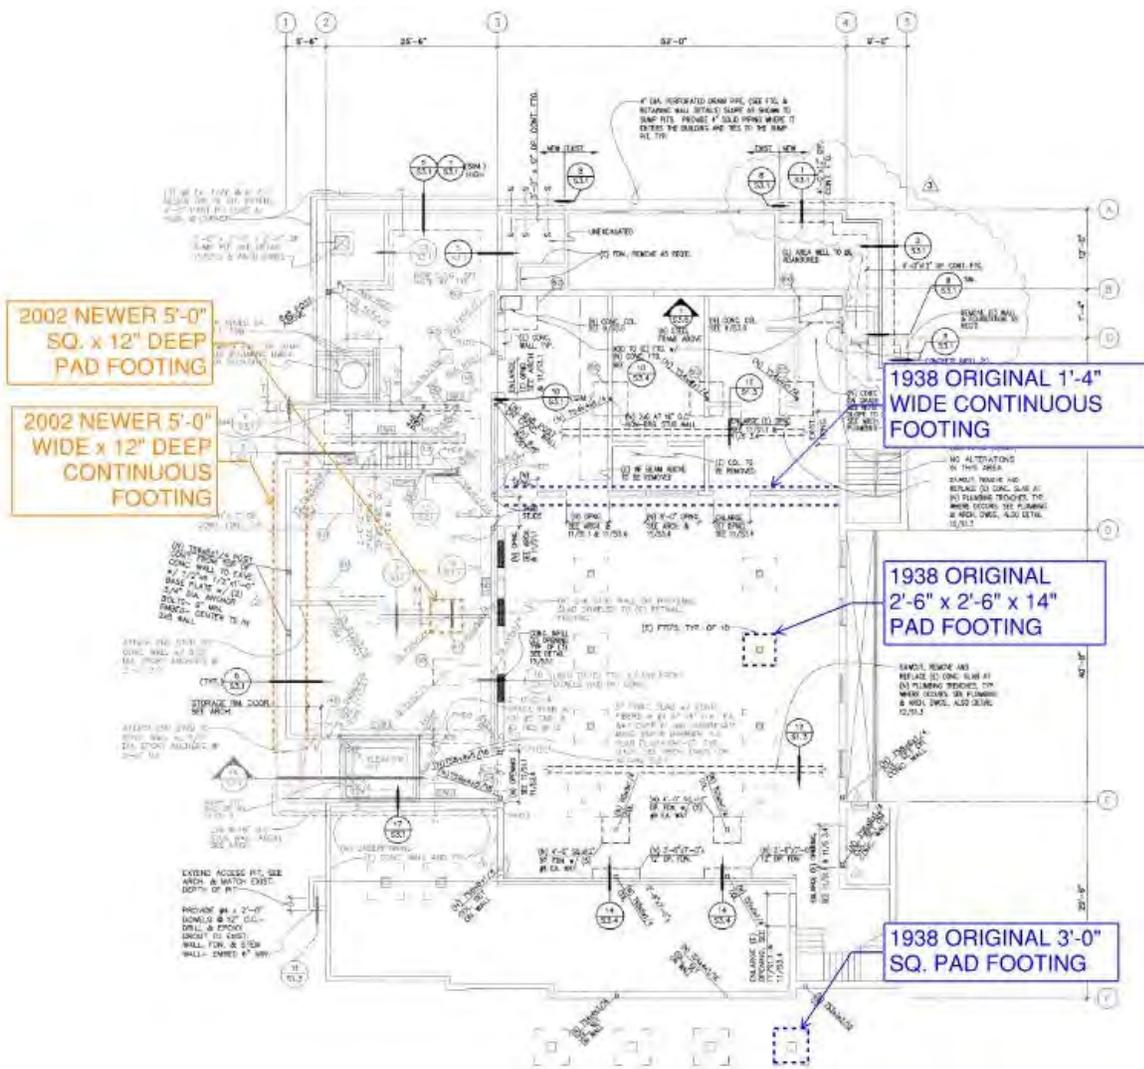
Foundation plan from the 2002 Construction Drawings illustrating some typical 1938 and 2002 foundations.
